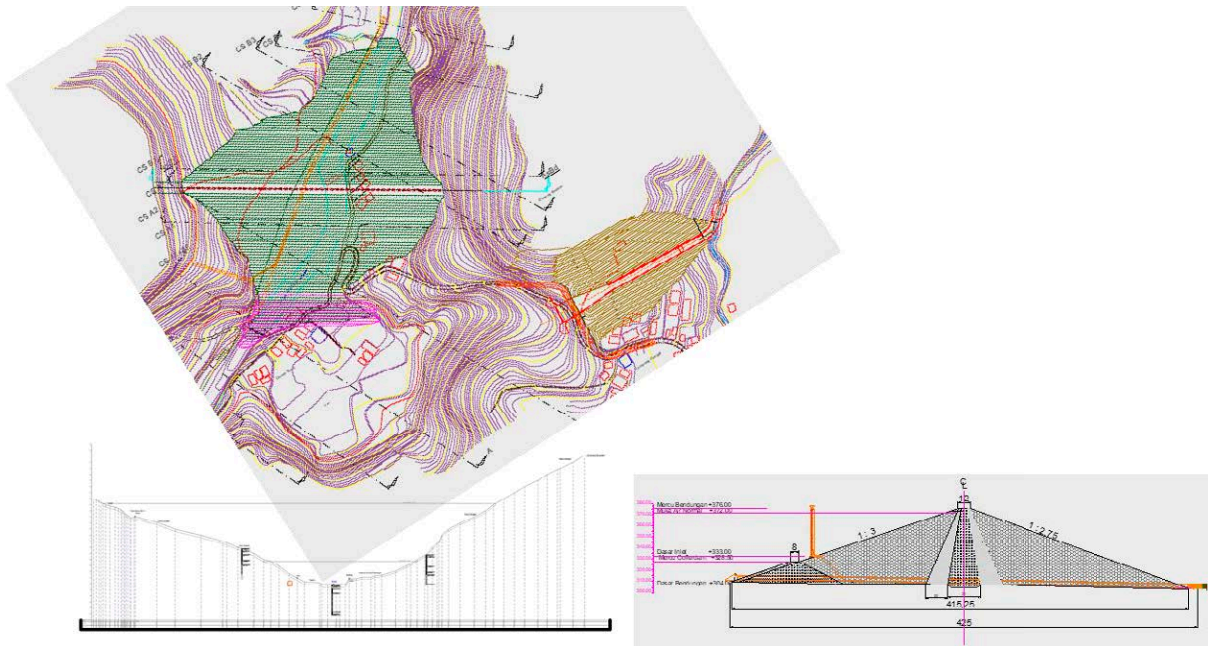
Plan-Section-Profile of Citeureup Dam
